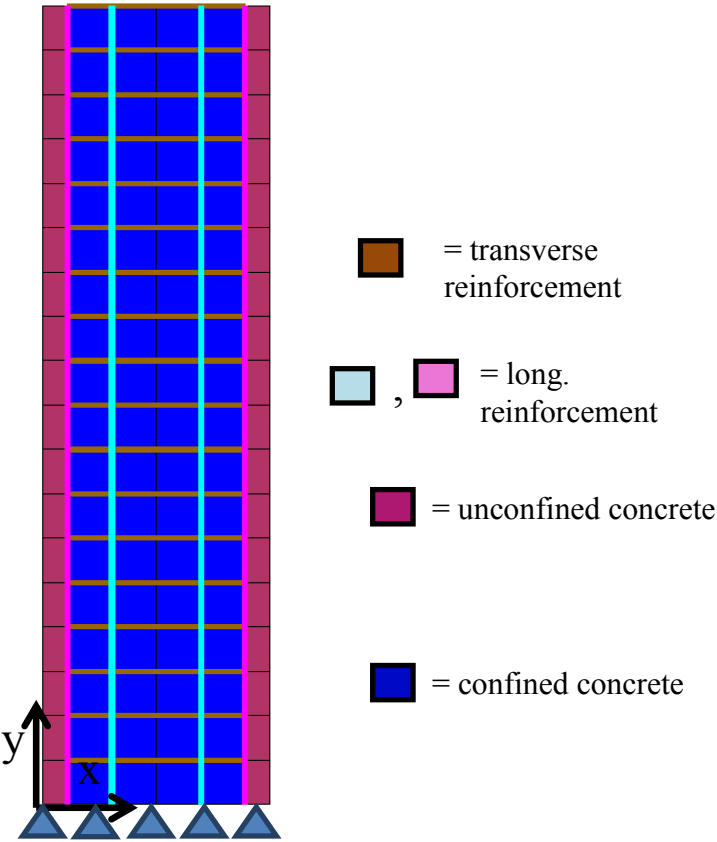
Finite Element Mesh with Confined and Unconfined Concrete using Steel Truss Elements
